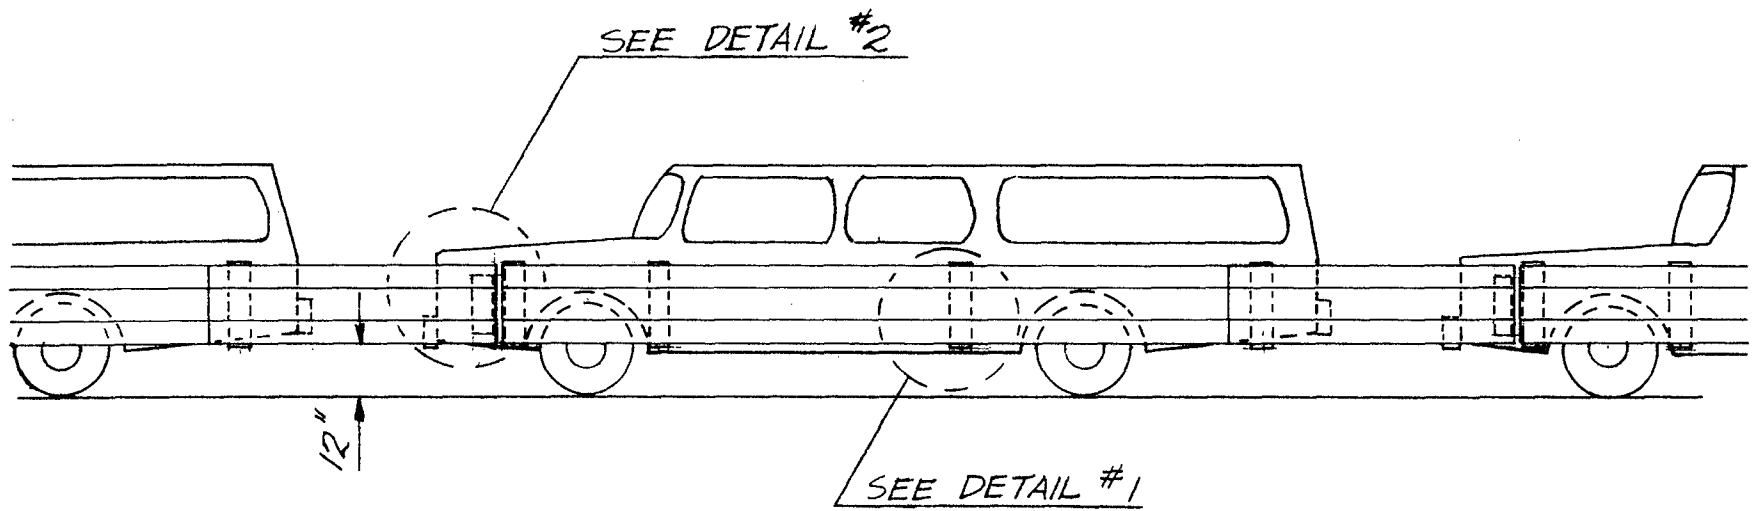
CONSTRUCTION DRAWING OF USED CAR BARRIER (continued).
